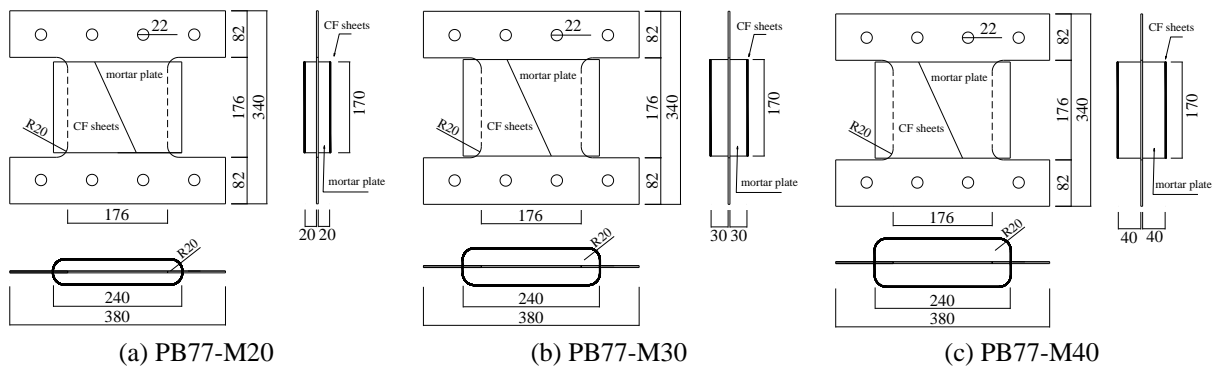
Examples of dimensions of test specimens (Unit: mm)
